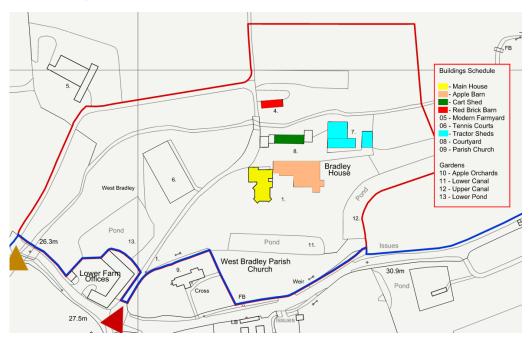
Existing Sitewide plan with the existing buildings inspected highlighted
